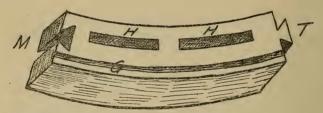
Illustrates a type of concrete block used in silo construction. H H are holes left in blocks. T and M are dove-tailed tenon and mortise so made that blocks interlock when laid on the wall. G is a groove made in block to imbed iron rod for reinforcing the wall.
